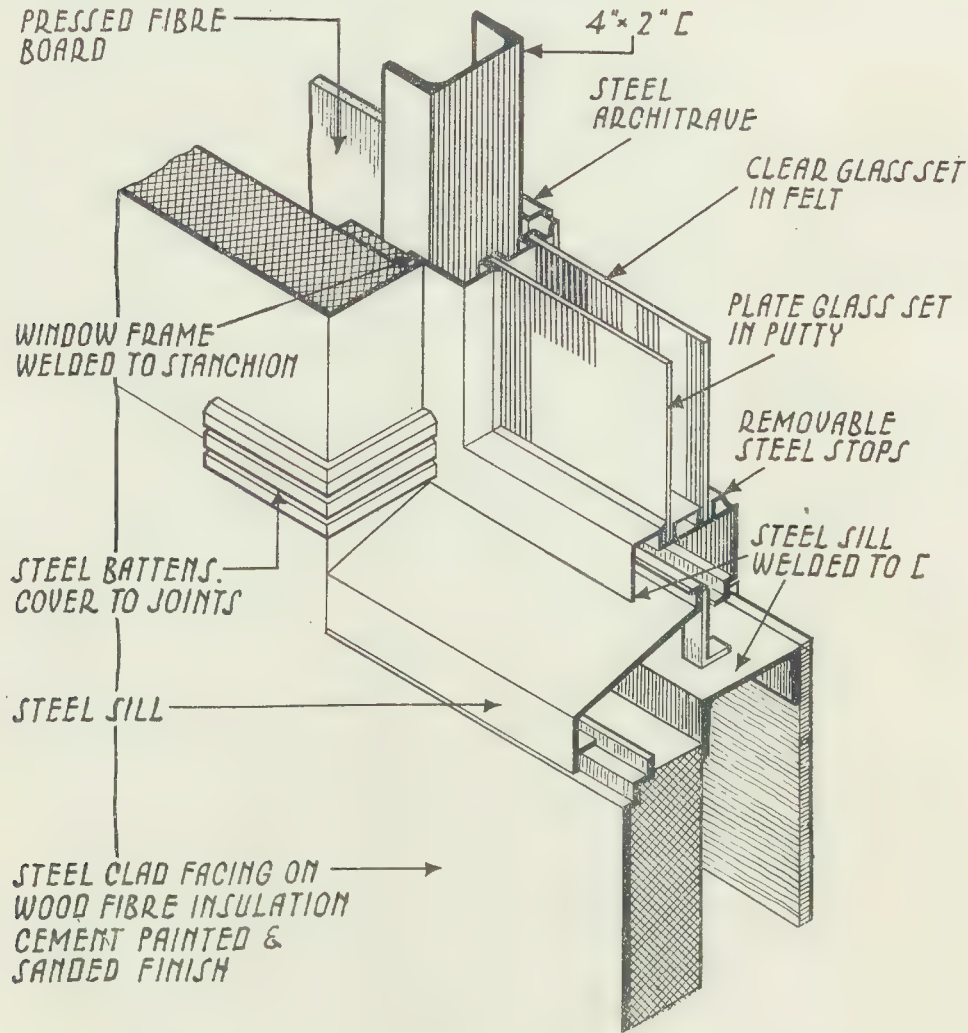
CONSTRUCTION OF WELDED STEEL FRAME AND MORTARLESS EXTERNAL WALL
